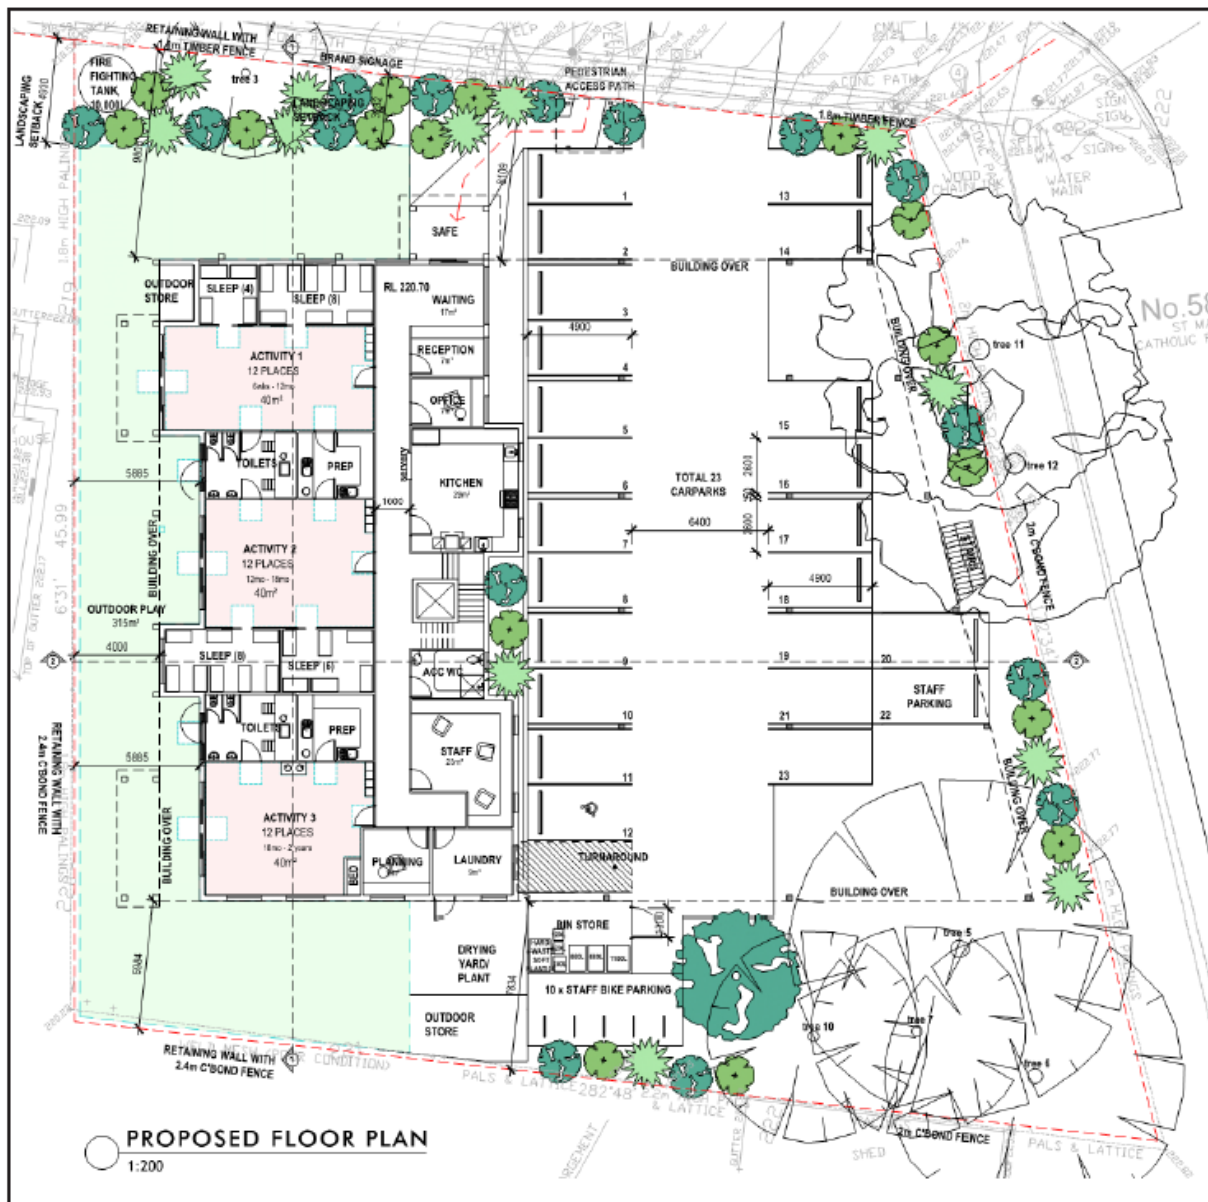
DIAGRAM SHOWING PARKING AREA
